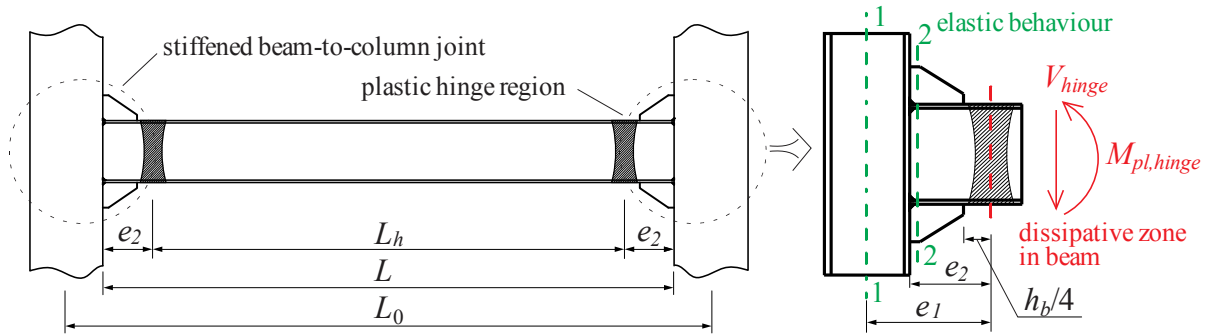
Typical beam span with stiffened joint, plastic hinge location and cross-sections used for design check
